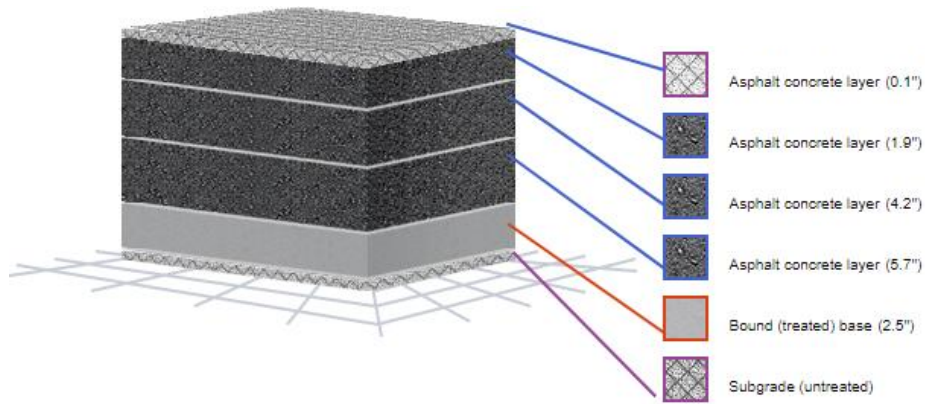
Pavement Structure for CO-560 Section (Source:InfoPave).
